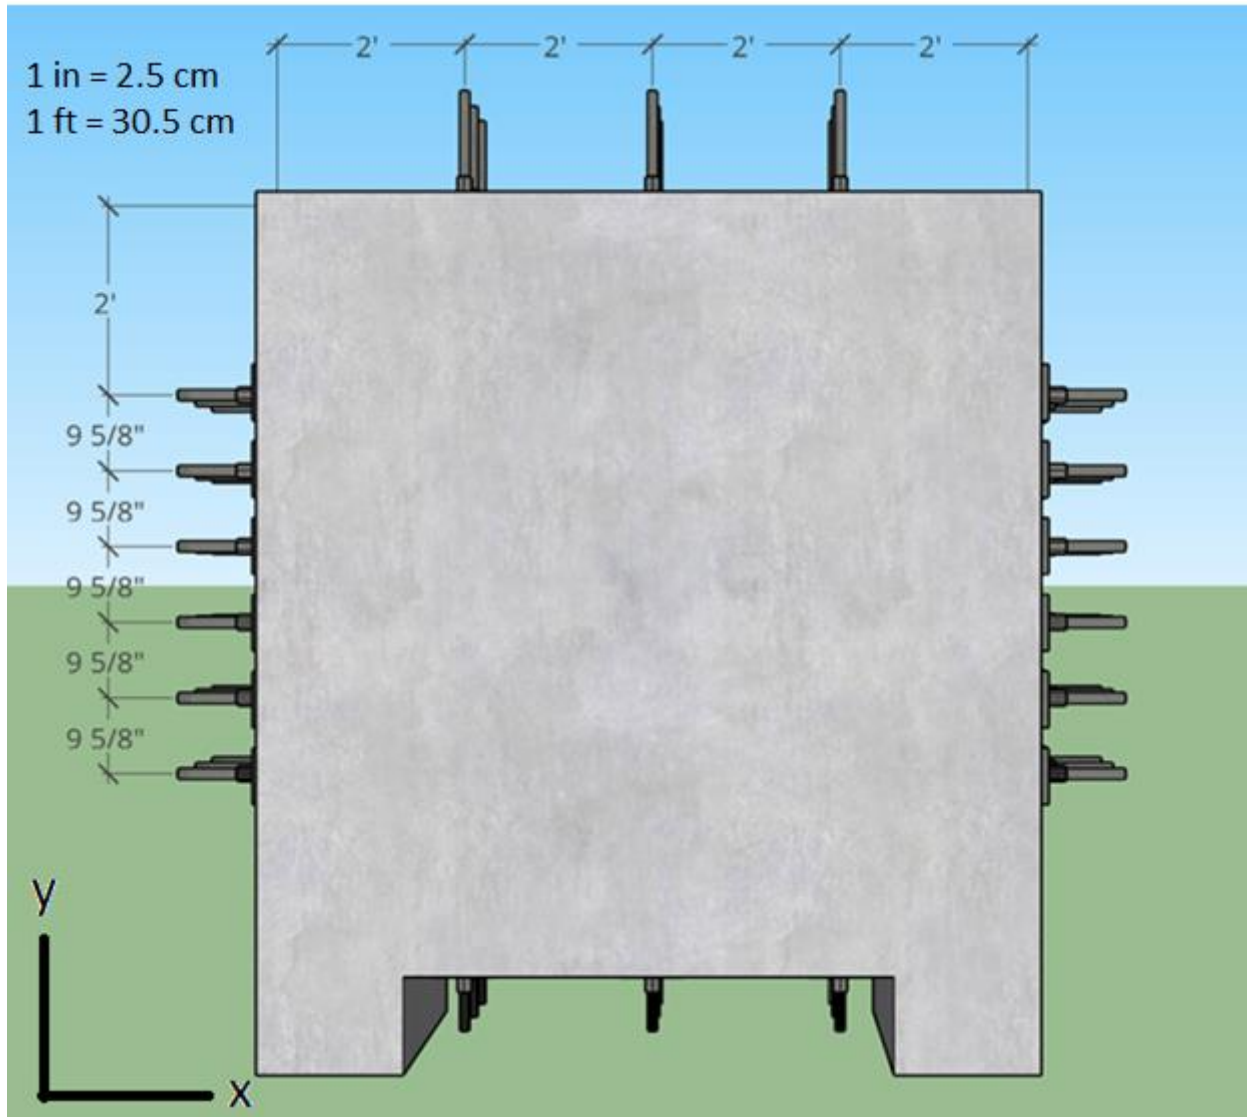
Specimen 2- Post-Tension Bar Layout Elevation View
